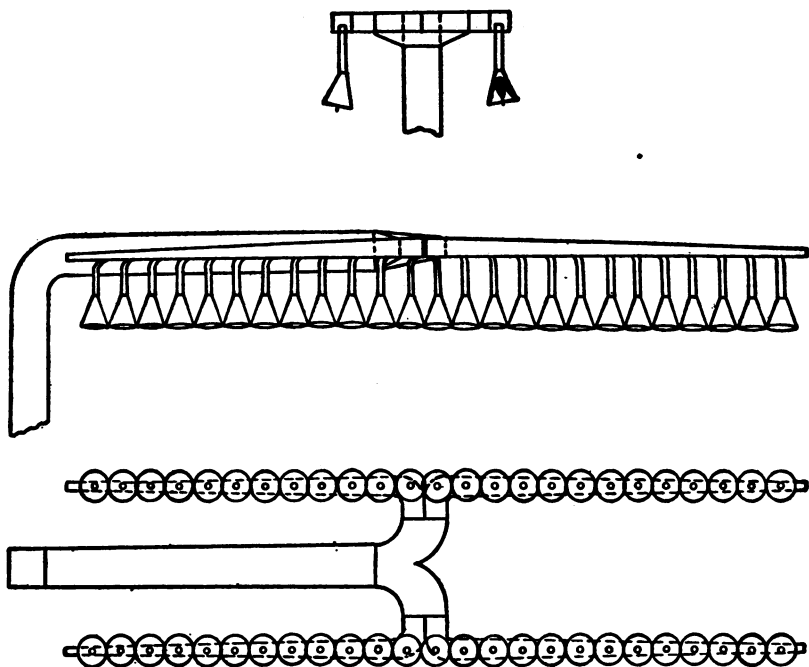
Schematic views of exhaust system applied to Foster winders.
